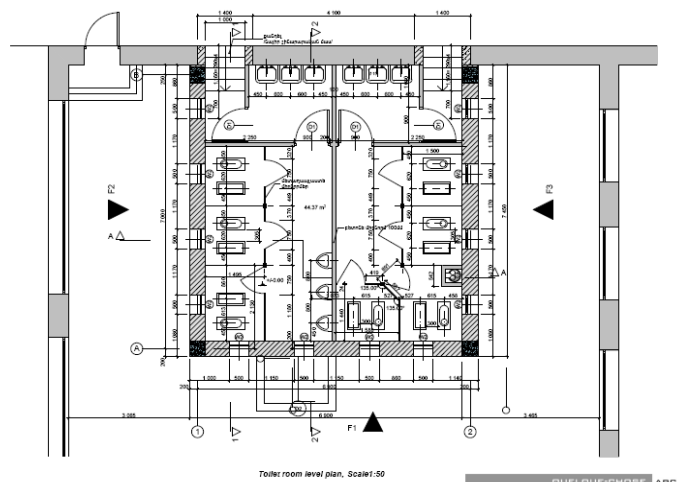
Floor plan of the toilet block; design: Quelque-Chose (source: AWHHE)
